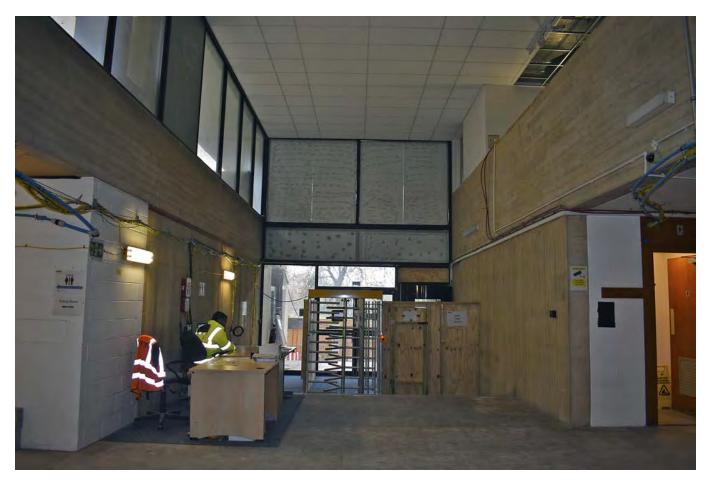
The foyer of the Tinbergen Building in Level B, looking east
